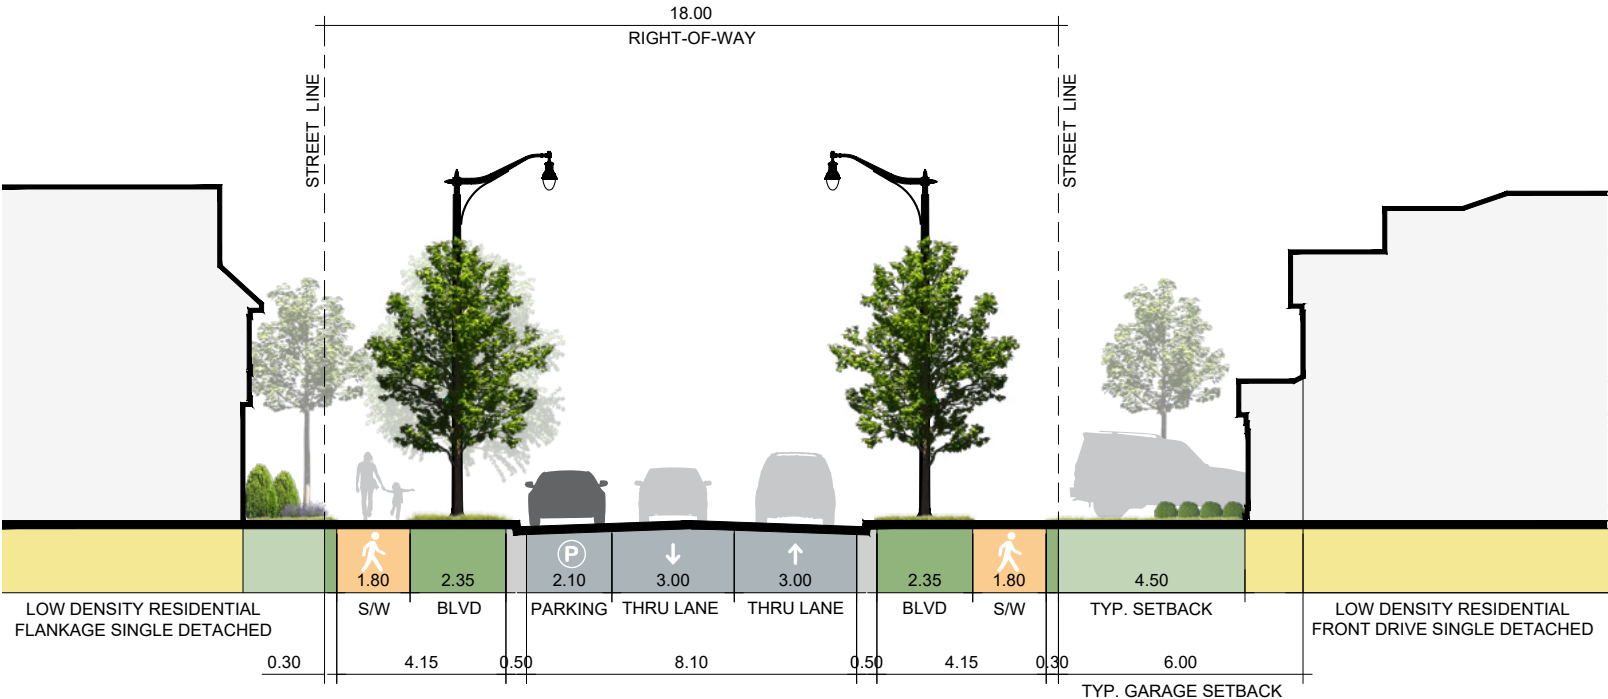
Proposed 18.0m Local Road ROW Cross Section
